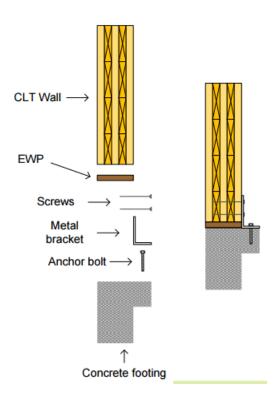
Wall to concrete connection using exterior metal bracket and anchor bolt and screws. (Adapted from Mohammad 2011)
